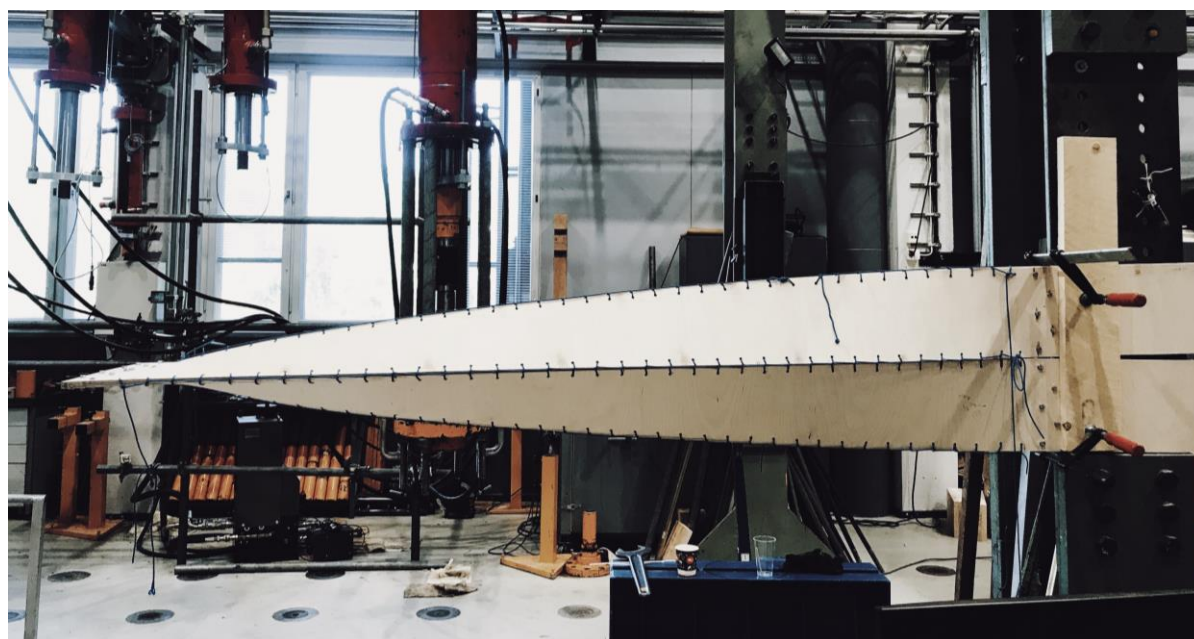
Cantilevering beam prototype from four torqued plywood strips with laced seamlines, clamped free end, and overlength of strips clamped to support
